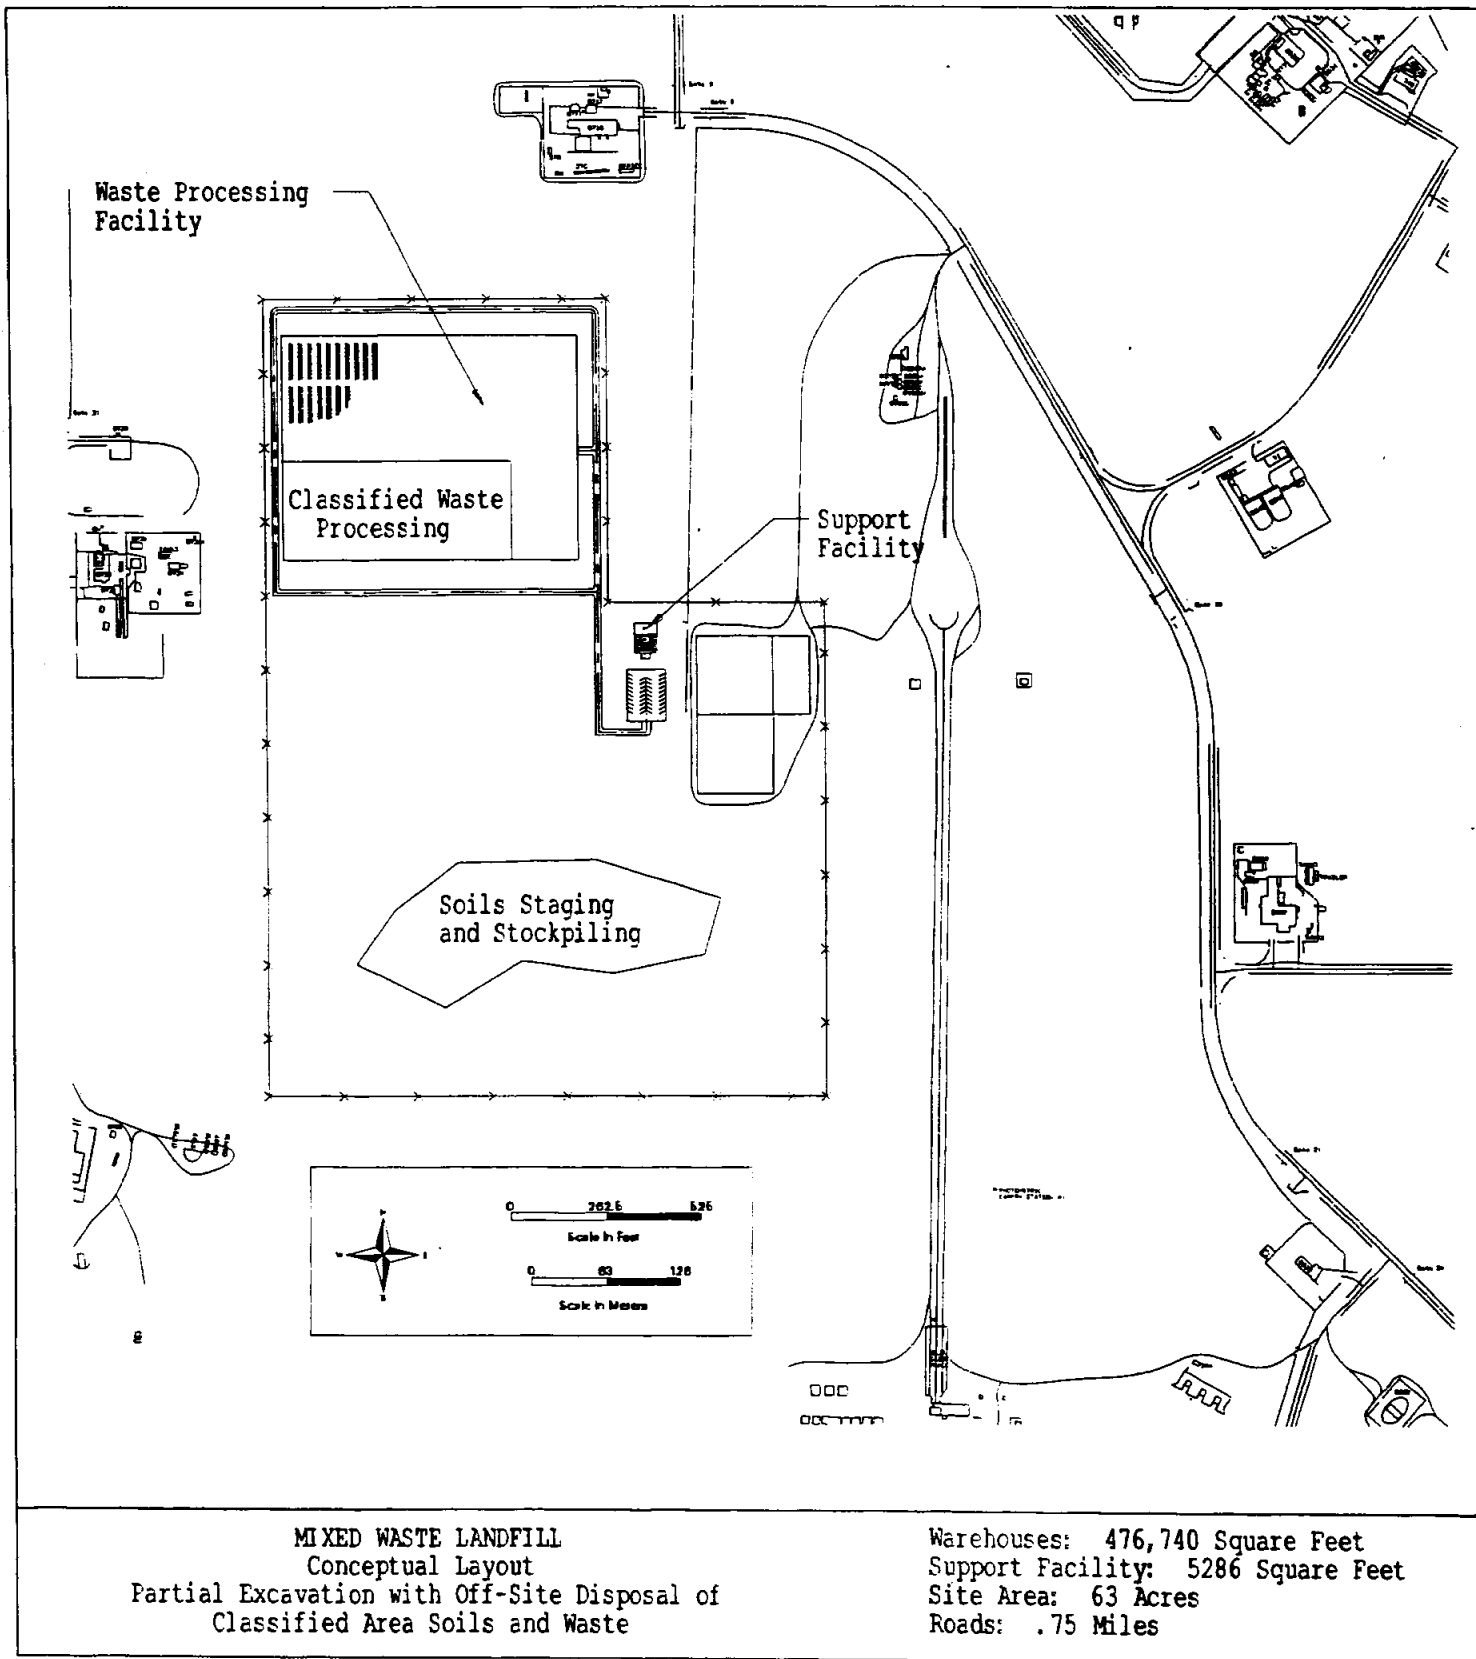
Partial Excavation with Off-Site Disposal and Backfilling
